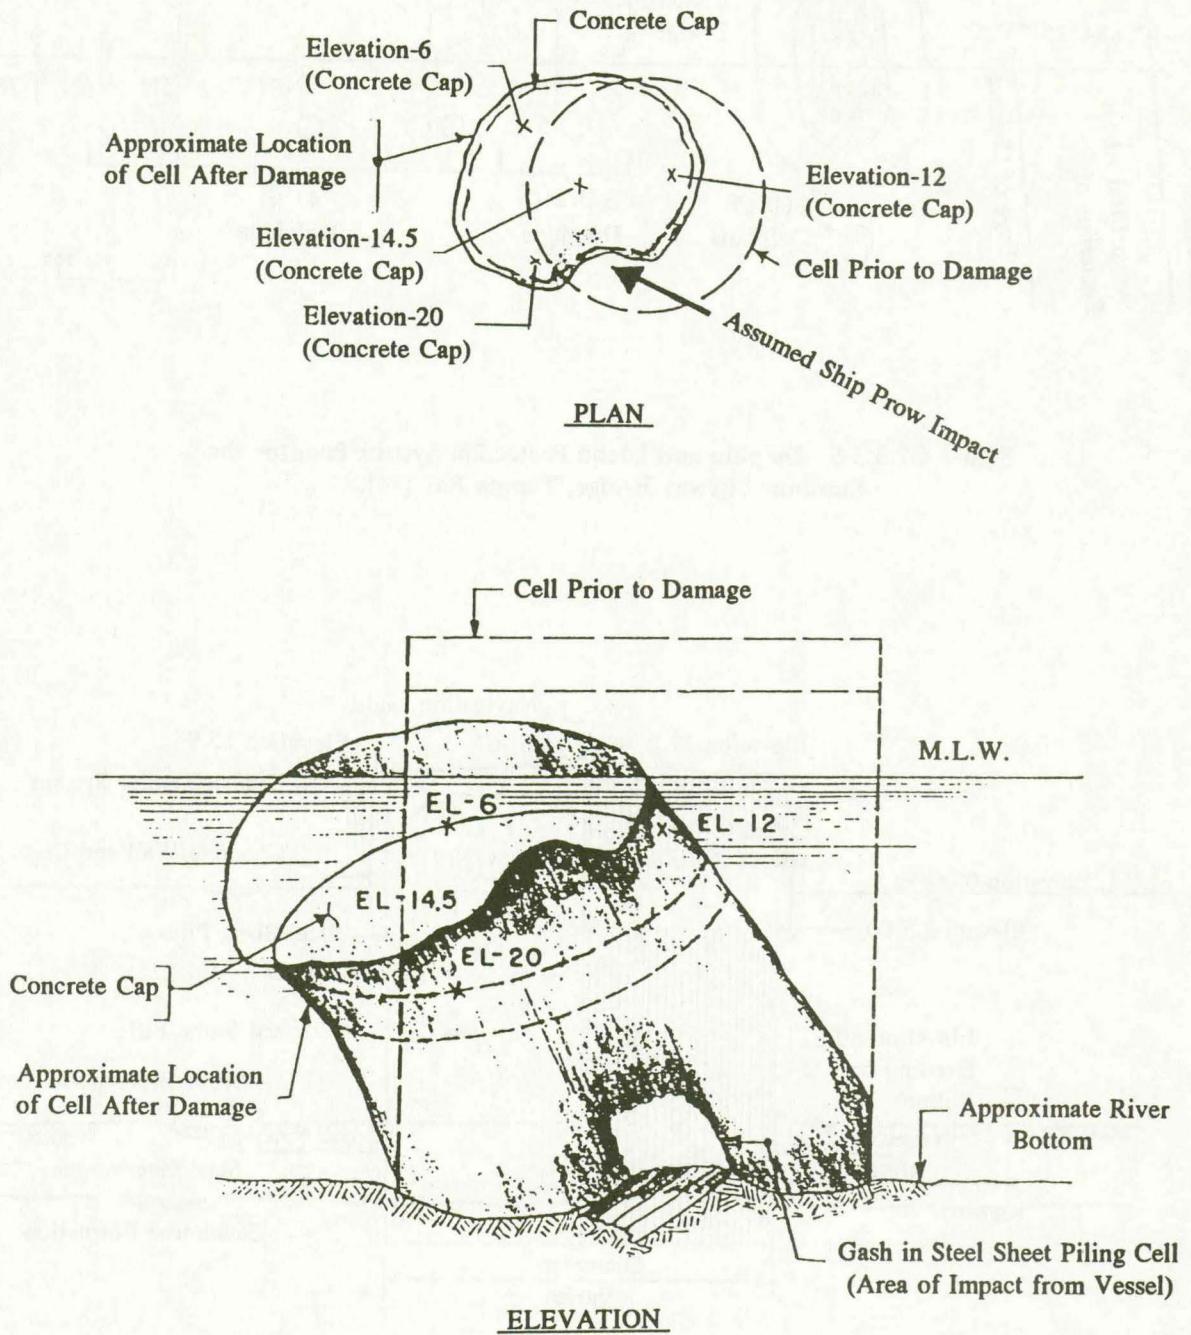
Damage to Dolphin No. 5 of the Outerbridge Crossing due to Ship Collision in 1987 [15].
